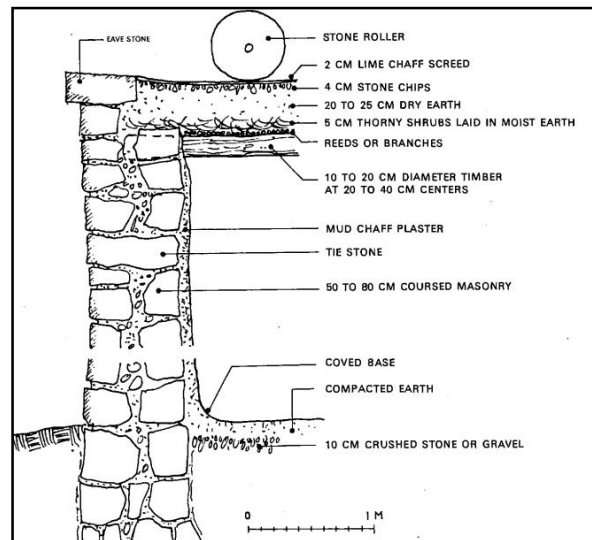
Flat Roof Construction in Lebanese Context. Source: (Ragette, 1974) Accessed: 22-1-2021
